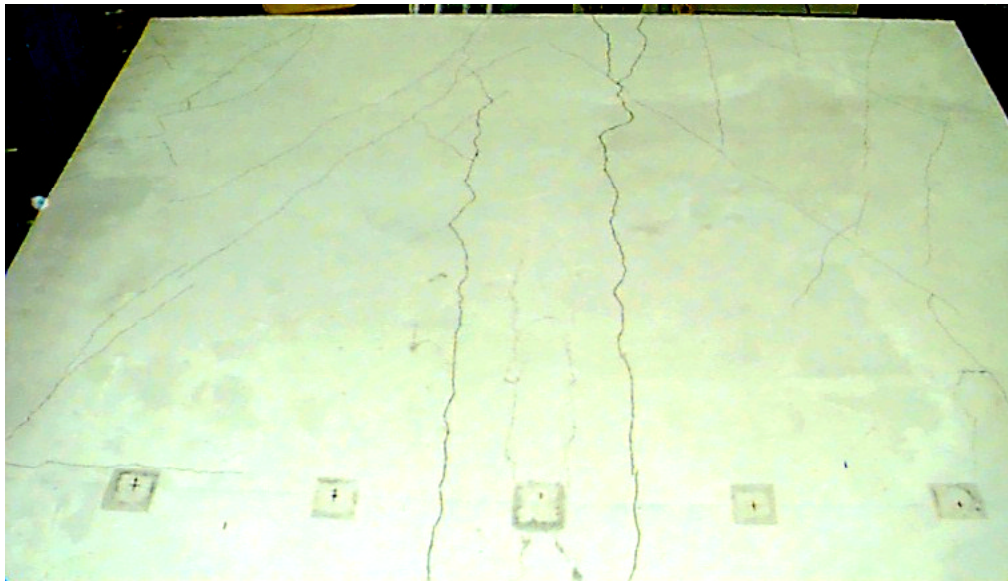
East End Slab Cracking Over IG (FF-2)
